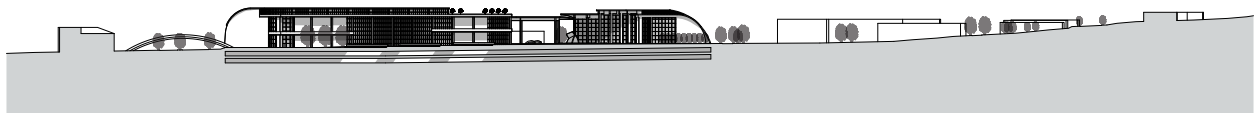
Longitudinal Site Section through West Town Forum showing the apartments and housing beyond (right), and the connections made to other sites (left).
